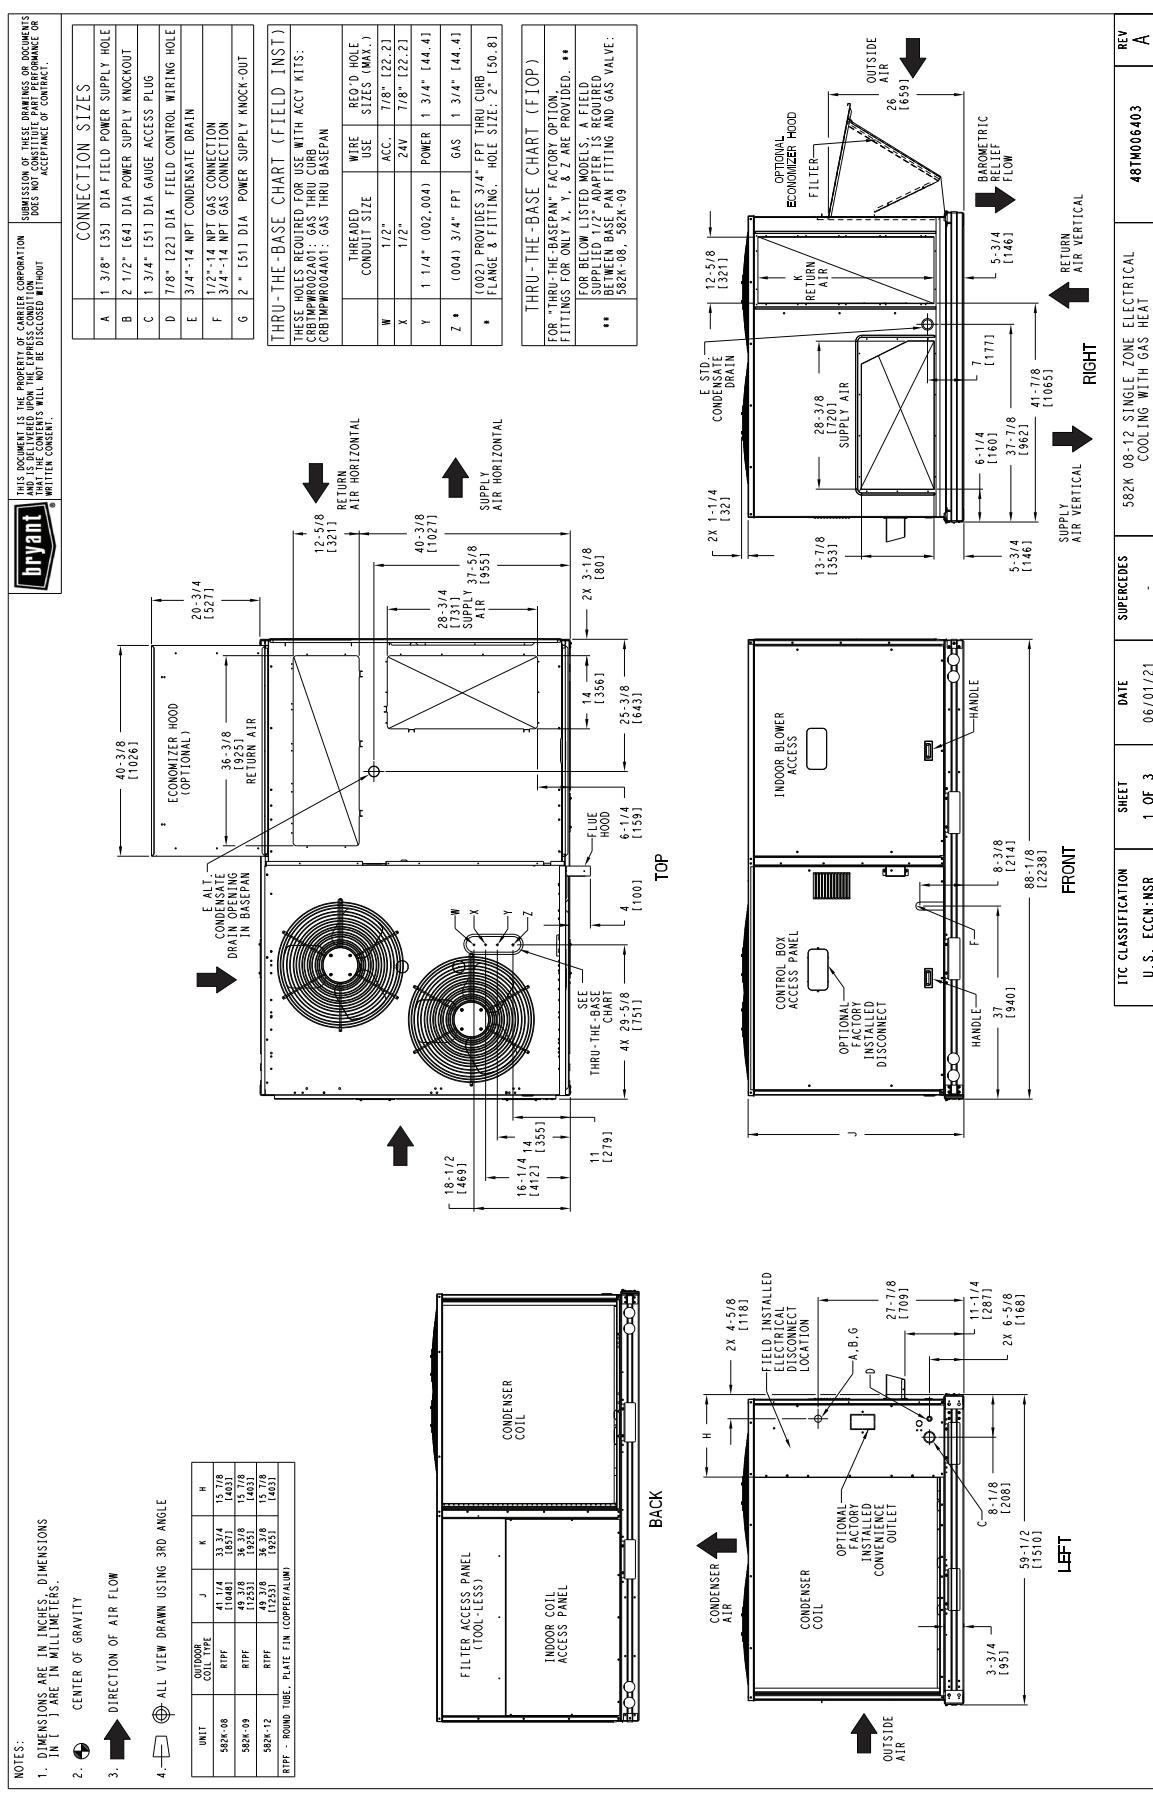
582K\*\* 08-12 Unit Dimensional Drawing
